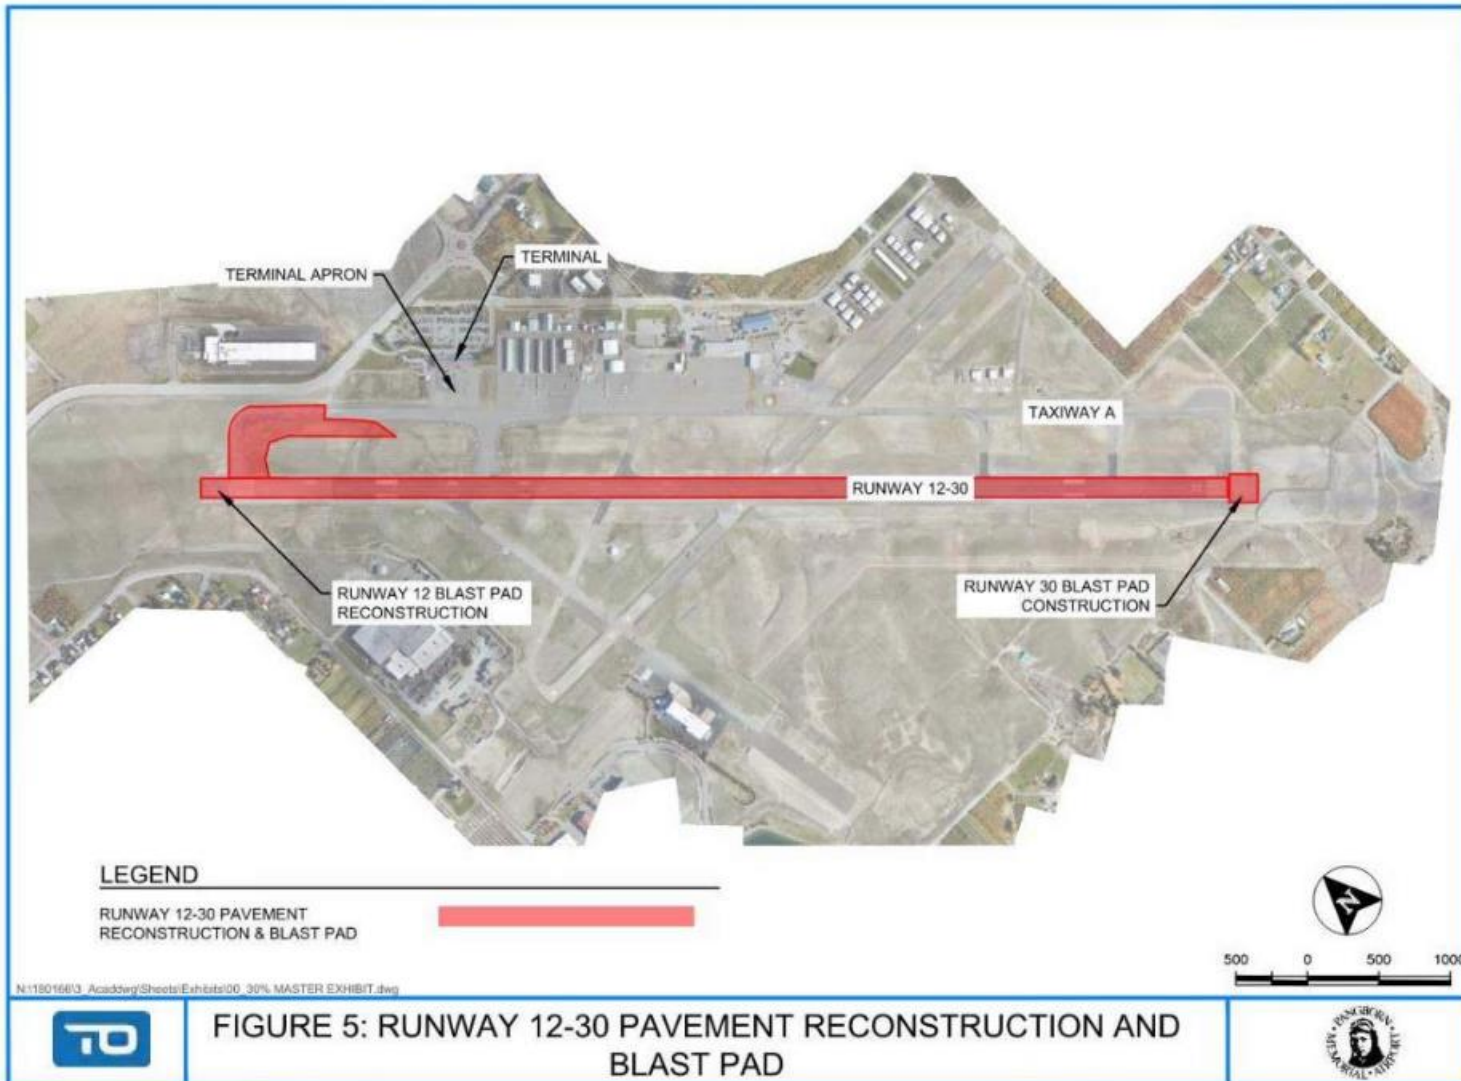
Runway 12-30 Reconstruction and Blast Pad, adapted from Proposed Improvements Exhibit, (dated 1/29/21)
